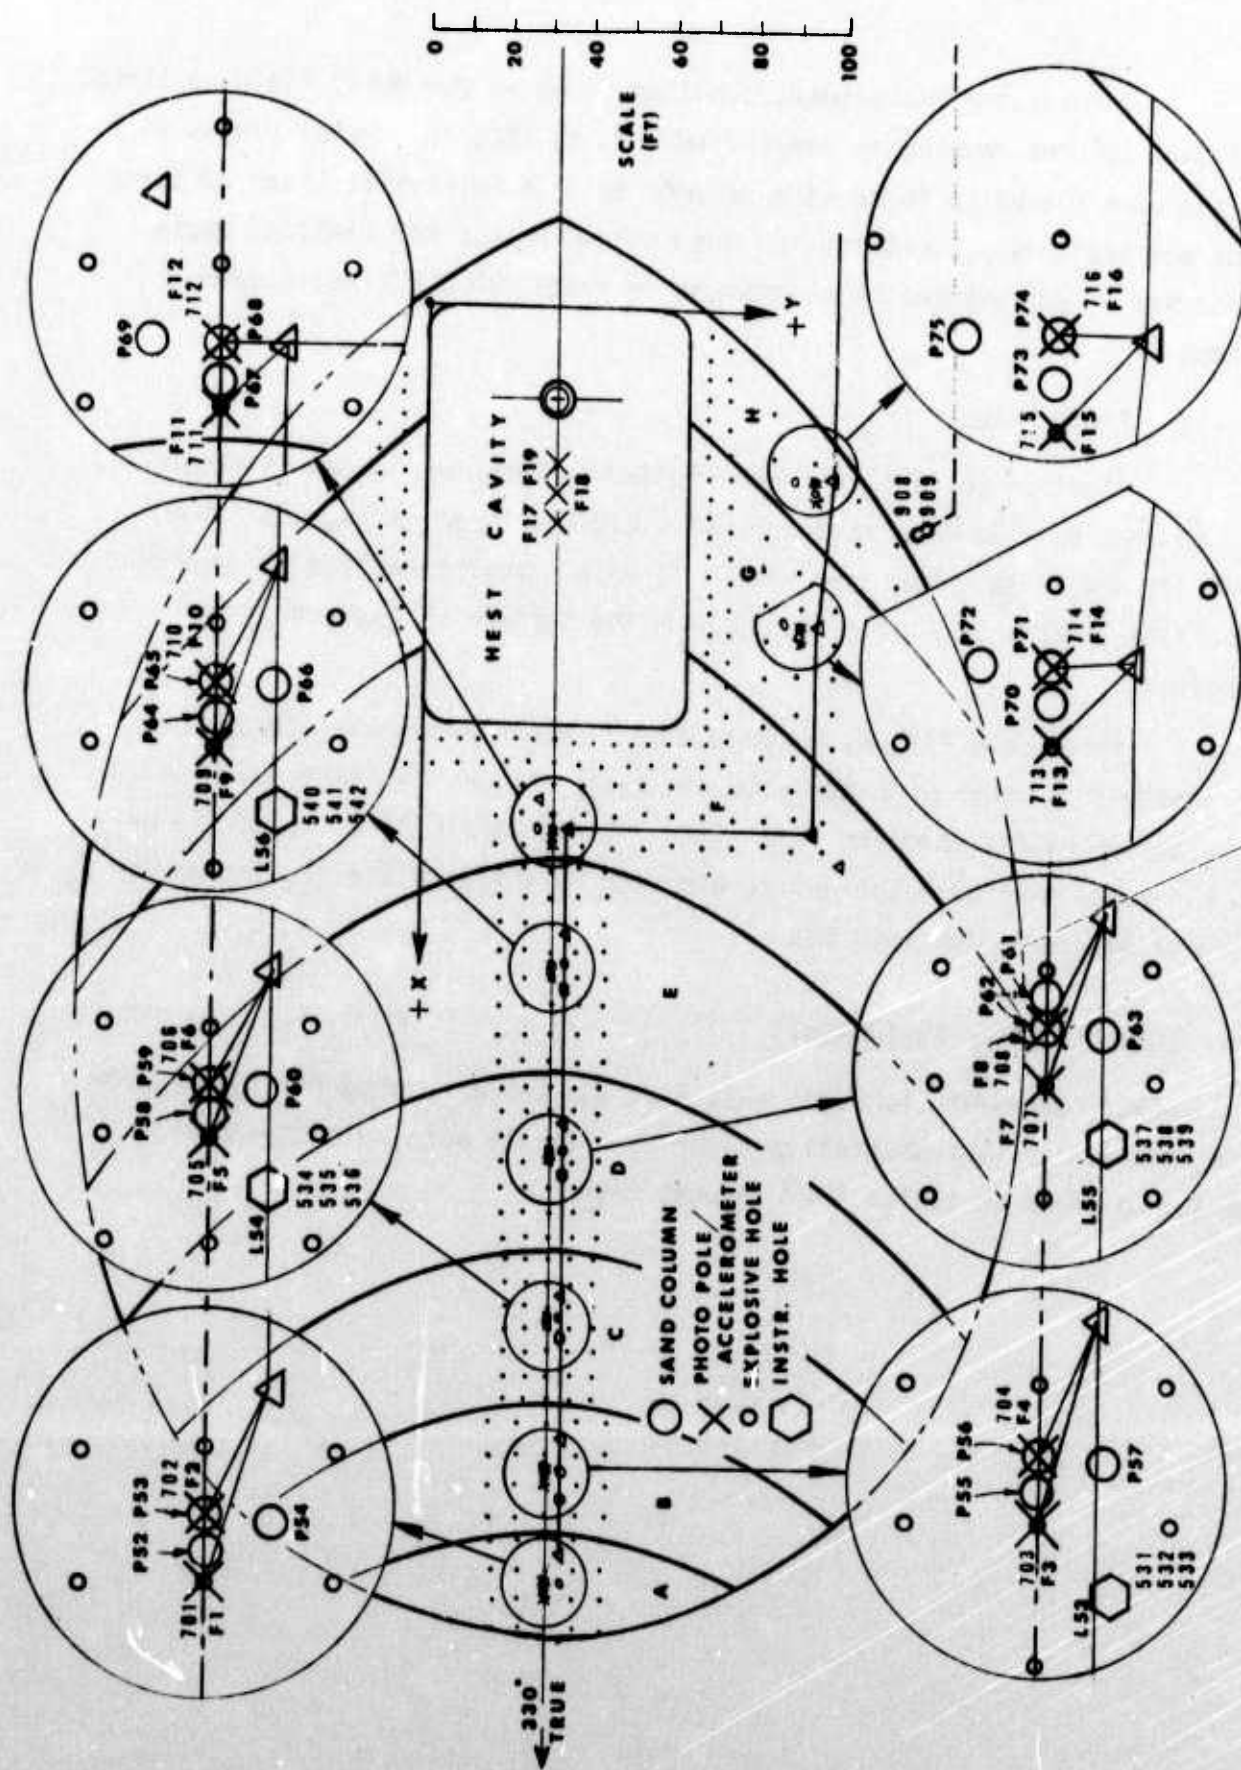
HARD PAN I-2A Test Configuration Showing BLEST Area Instrumentation Locations and Photo Poles
